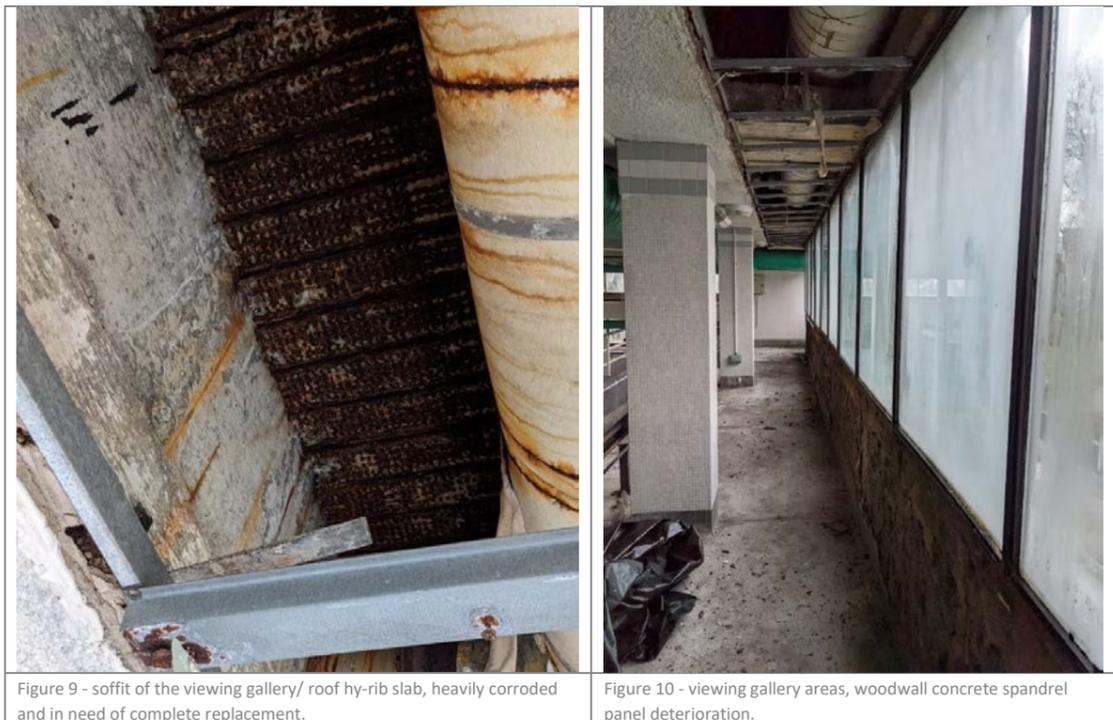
soffit of the viewing gallery/ roof hy-rib slab, heavily corroded and in need of complete replacement.
